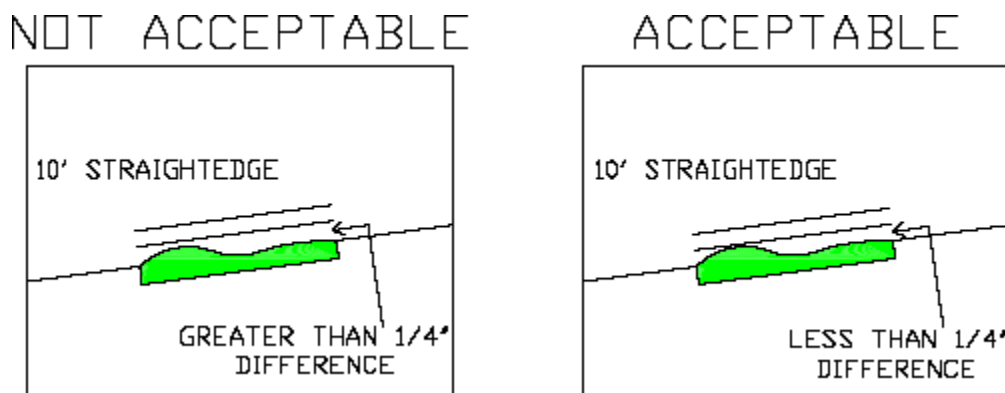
Example 8: Surface tolerances for street repairs should meet the standard for new construction.
